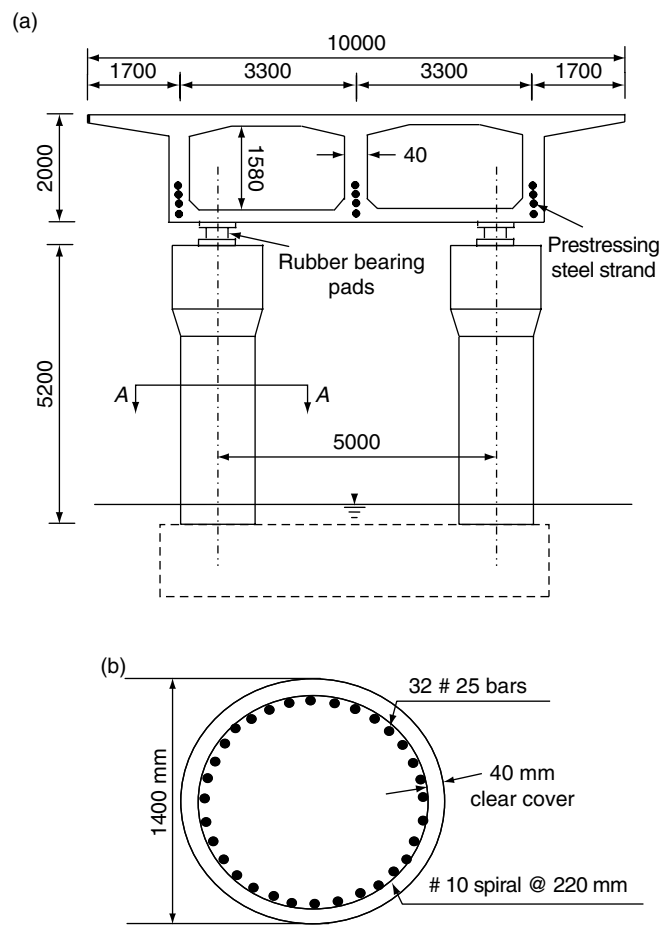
(a) Cross section of the bridge at the pier centre; and (b) Cross section of the bridge column
